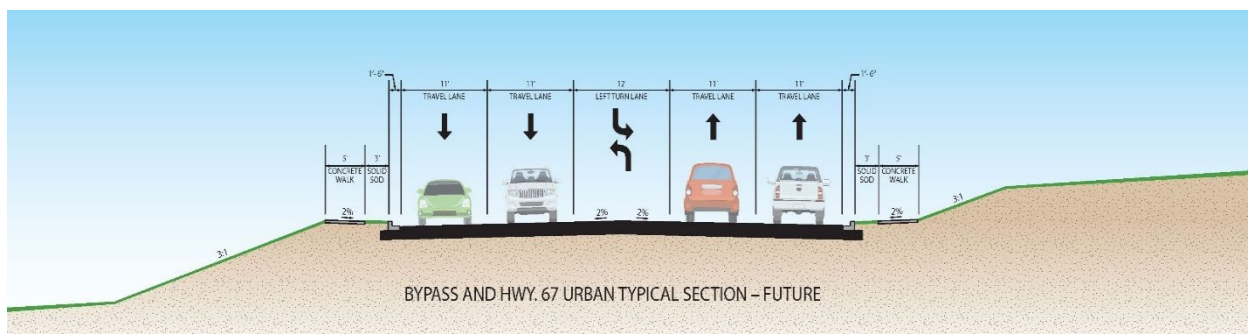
Bypass and Hwy. 67 Urban Typical Section - Future
